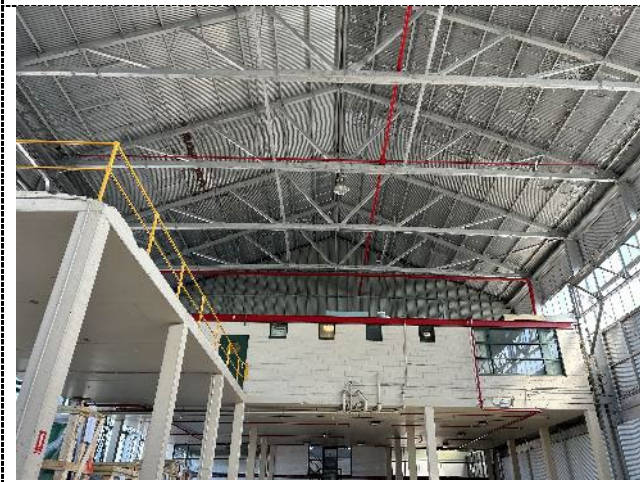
The 1989 mezzanine extends east of the brew house to accommodate offices, which have views out into the double height southern warehouse. The offices have metal cladding to the upper sections of the wall, steel trusses and concrete block walls below the windows.
